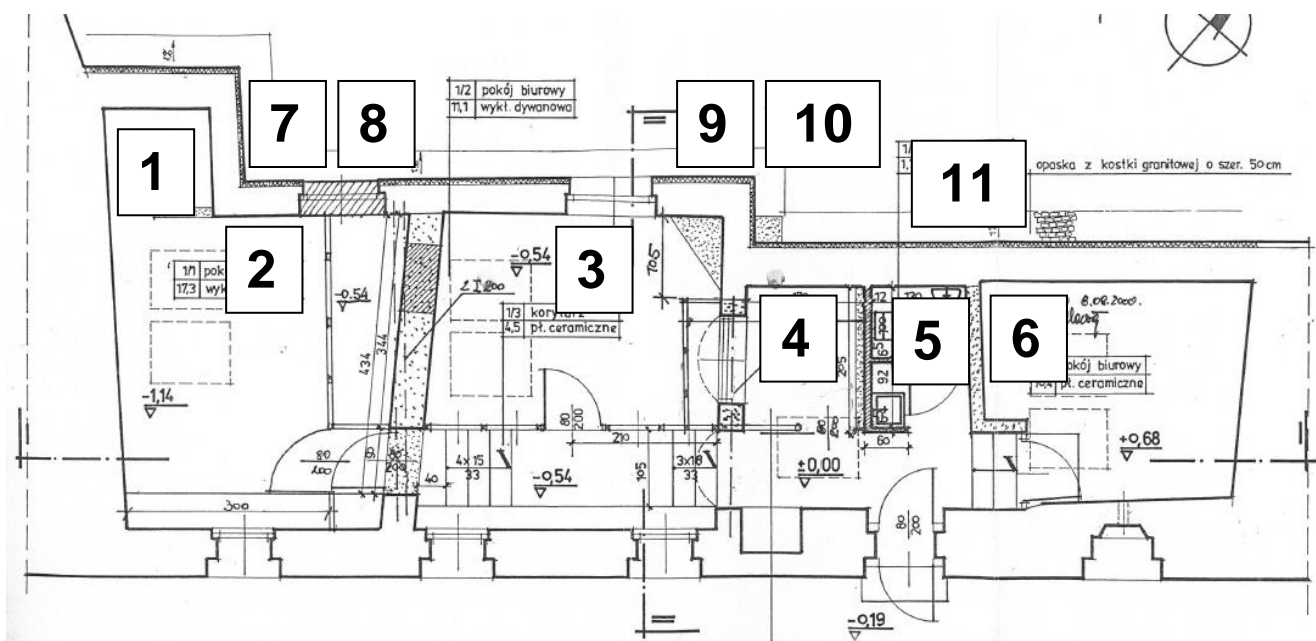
Location of opencasts in the external wall (on the slope side) of the former office rooms (A): 1, 2, 3 ... - number of the opencast
